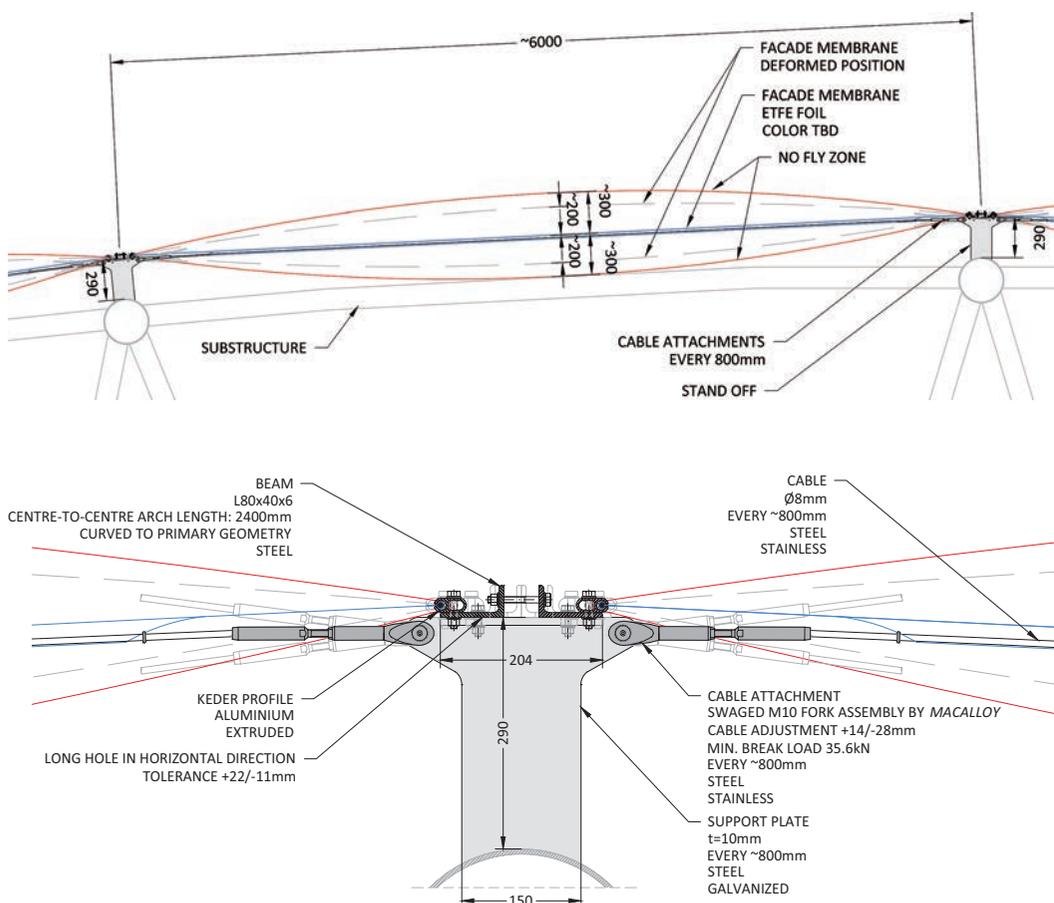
Deflection of ETFE façade panel – horizontal section; source: LEICHT
